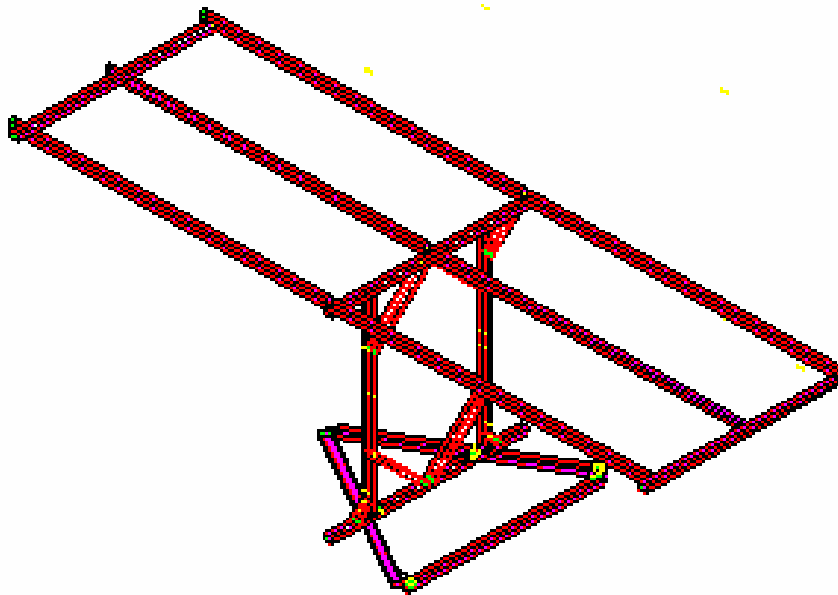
Isometric drawing of the test bridge without the abutments.
